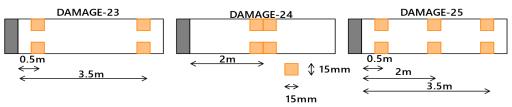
Test damage scenarios on reinforced concrete beam.
